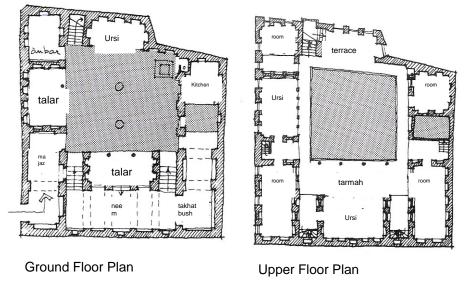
Modification of structure to fit to irregular plot in a traditional house in Baghdad (Source: Schoeauer, 2000)
